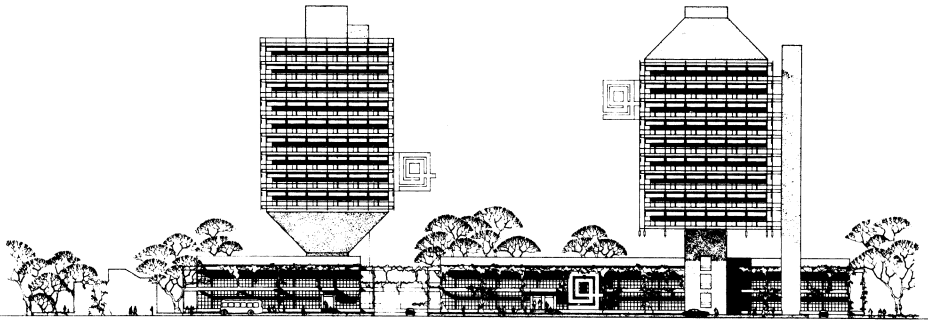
Egon Eiermann, Office Building and Training Center, German Olivetti Company, Frankfurt am Main, 1968–1972. Preliminary design. In contrast to the executed design, the office tower was initially designed as hanging construction (The Architectural Collection of the University of Karlsruhe).
